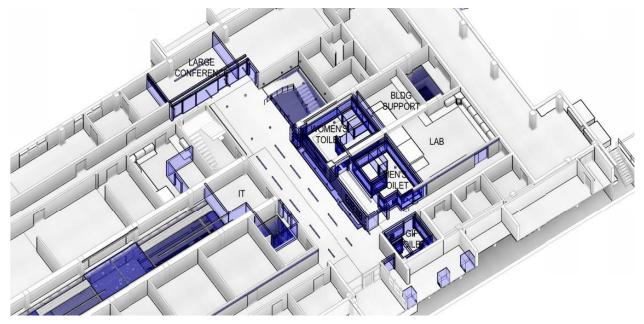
Phasing Diagram New Floor Plan, Level 2
